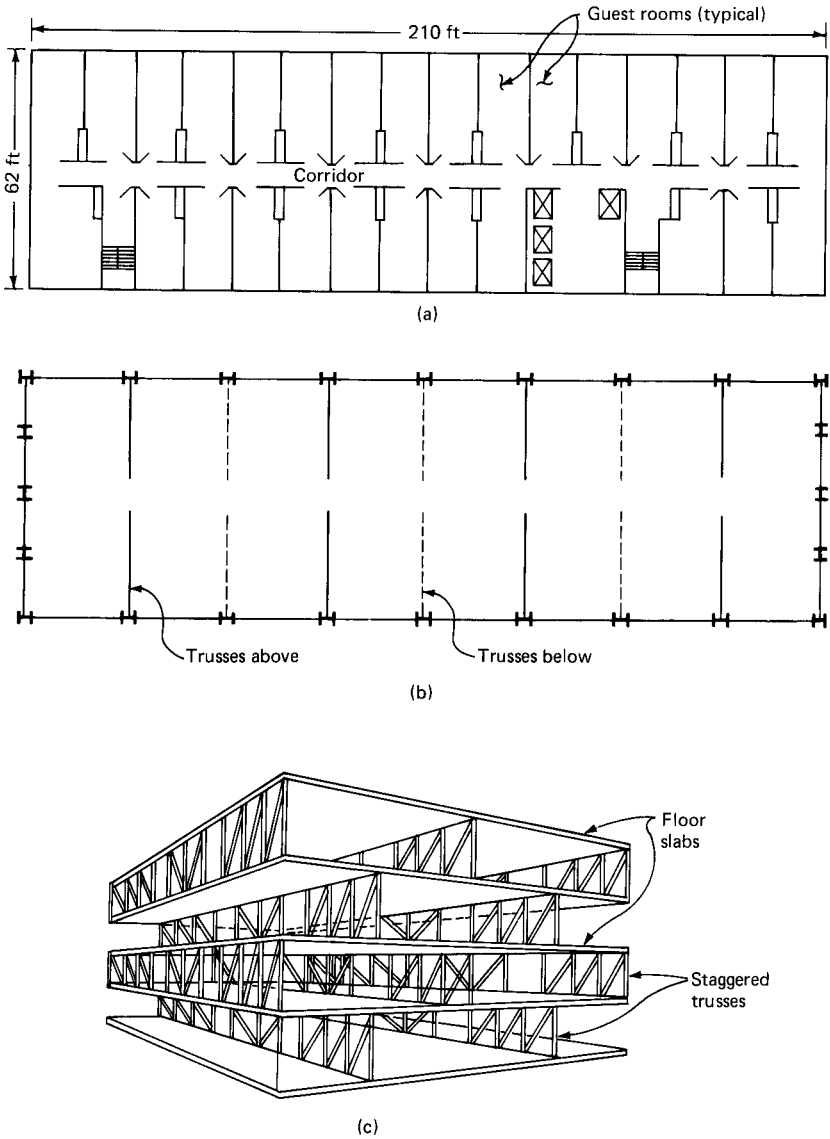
Staggered truss system. (a) Hotel plan showing layout of guest rooms; (b) arrangement of staggered trusses; (c) perspective view of truss arrangement.
